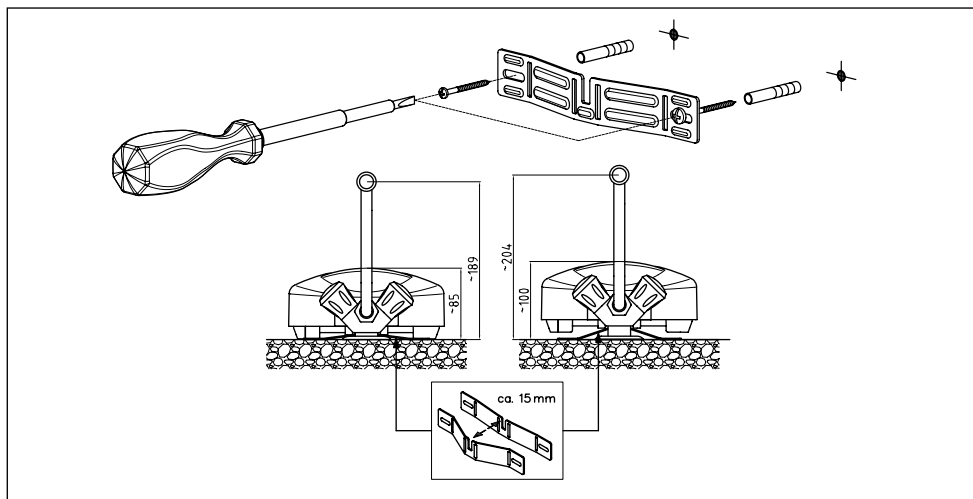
"Installing the metal wall bracket" (dimensions in mm)
